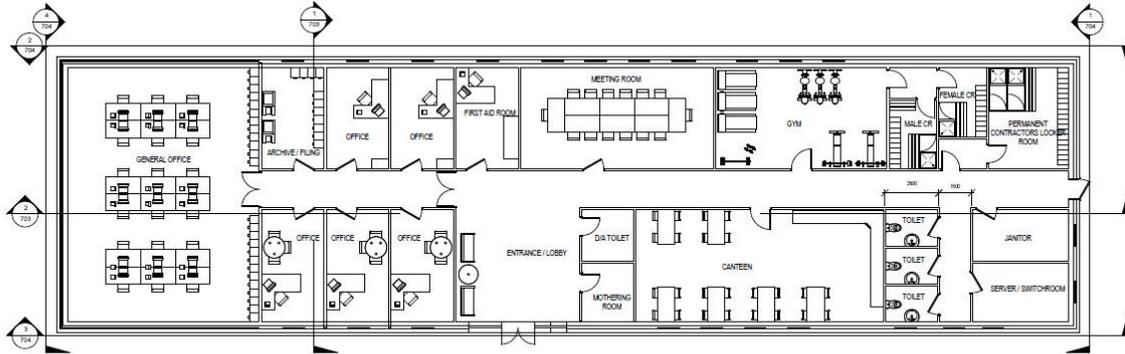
Proposed office layout showing 18 people in open plan plus five individual offices
